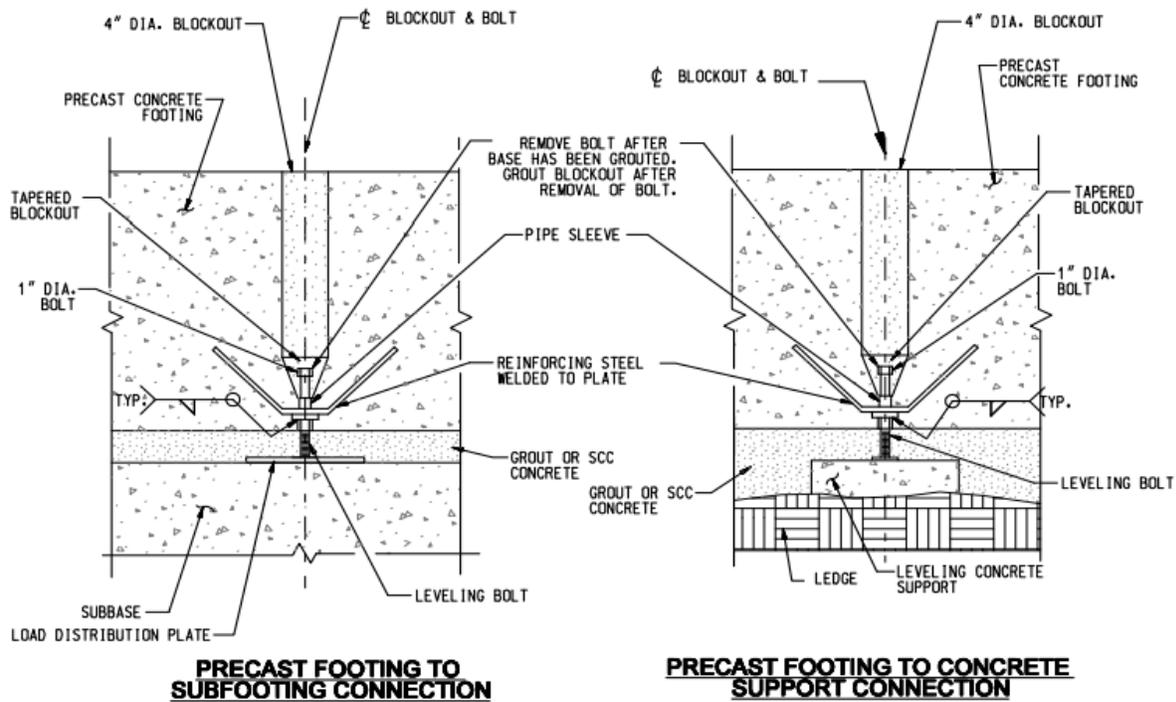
78 Details of Precast footing to subgrade Connection [8].
